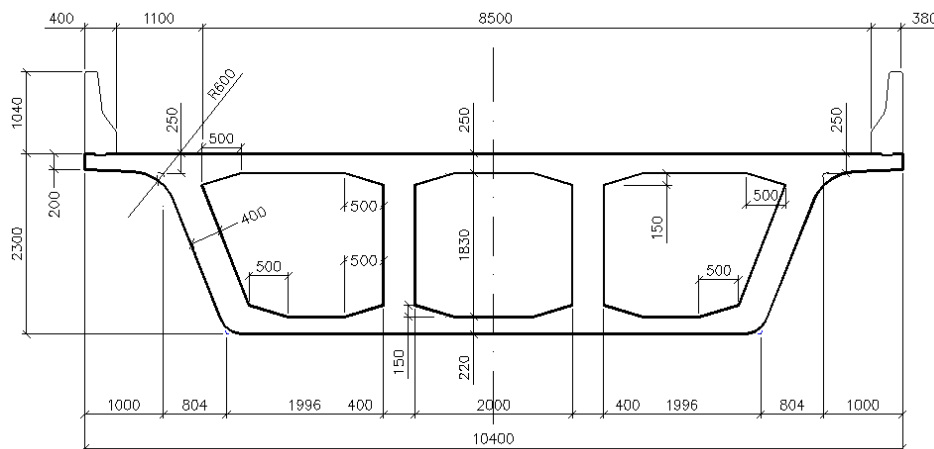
RC Bridge. Geometry of the section of the deck (dimensions in mm).
